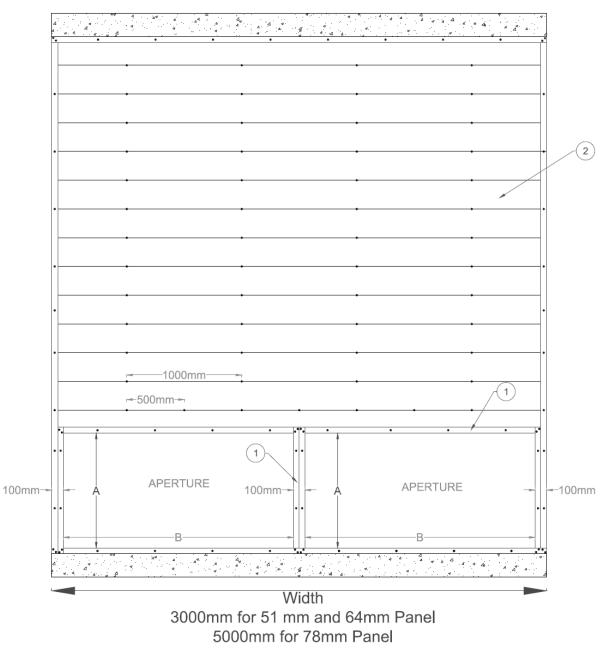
Horizontal Speedpanel arrangement of apertures at the bottom of the wall
